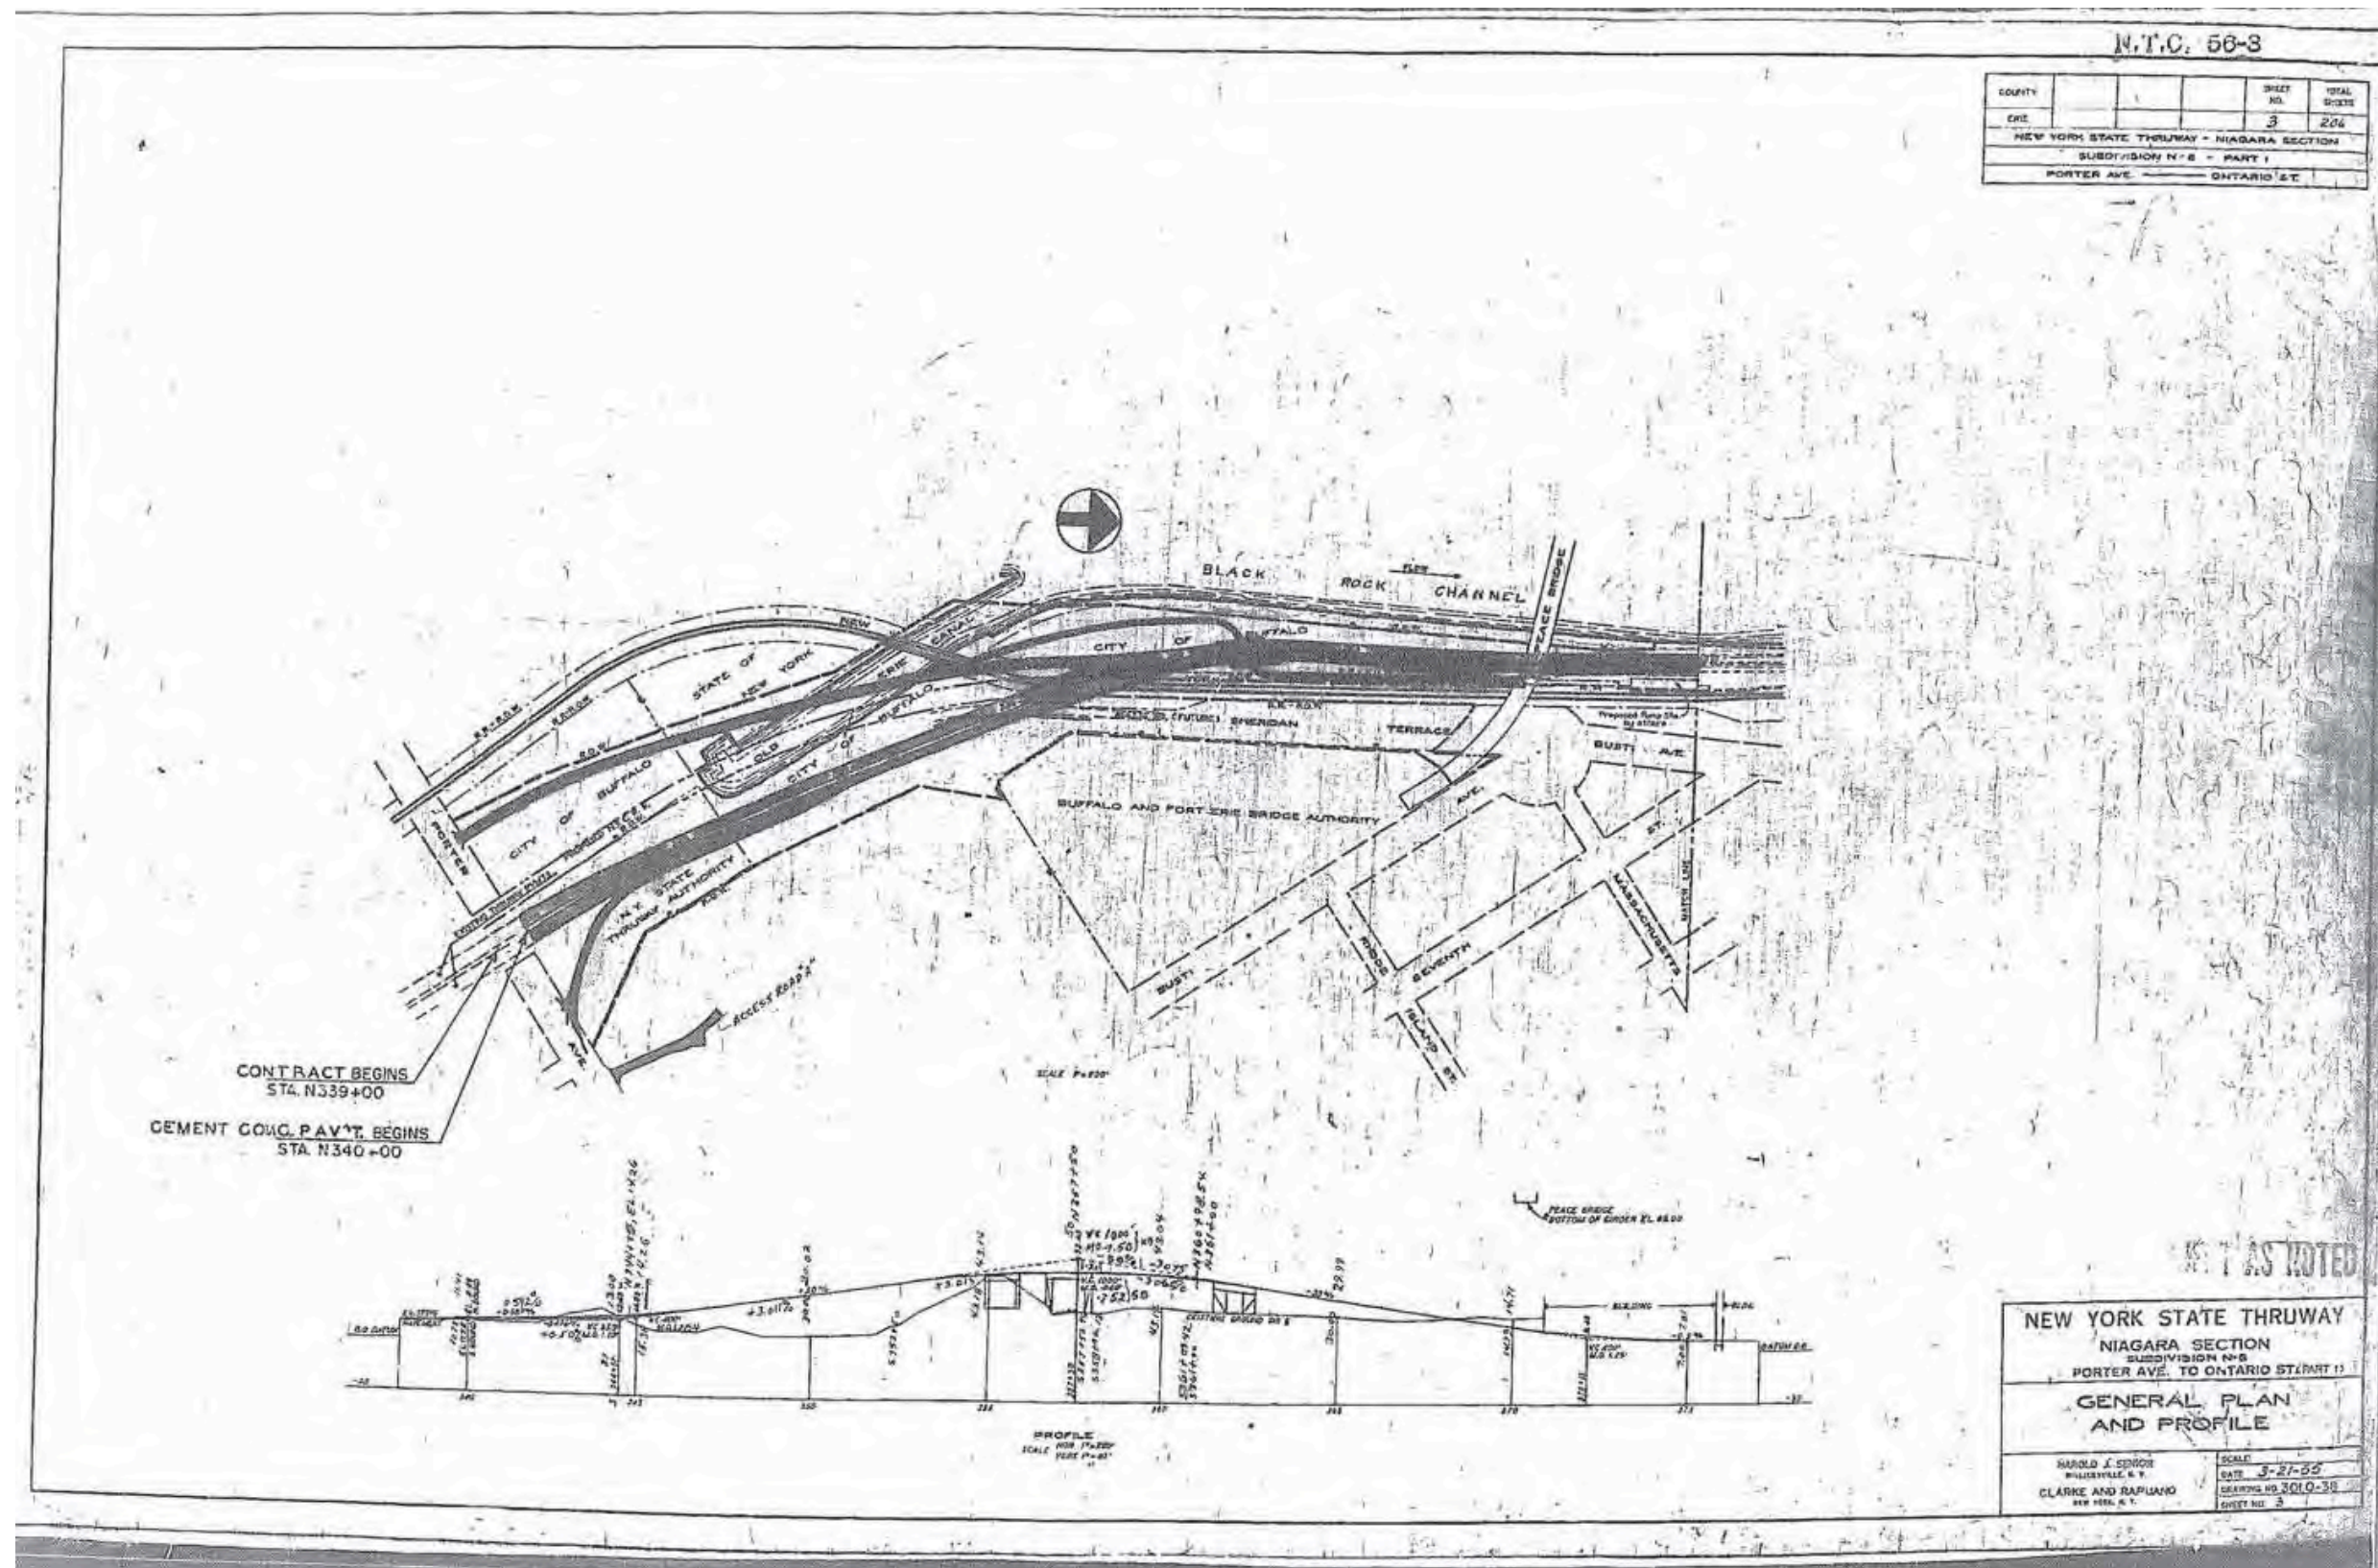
General Plan and Profile Sheet No. 3, New York State Thruway, Niagara Section, dated 3-21-55.
